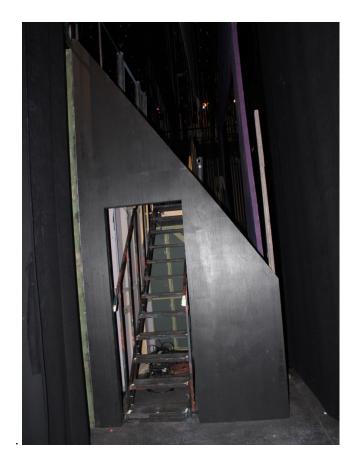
Backstage picture of the stud wall-jack-doorway supporting UGC platform
